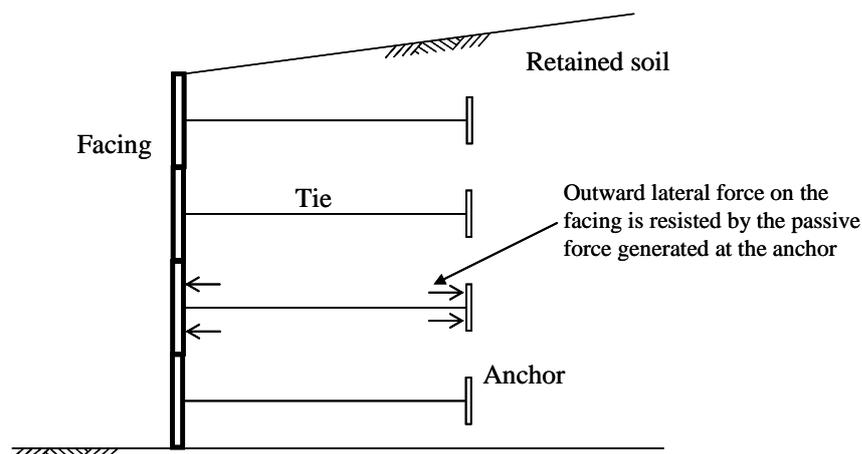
A section through an anchored earth wall (diagrammatic only)
